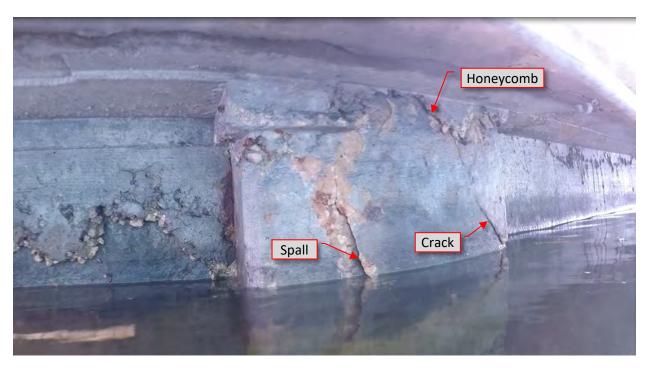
P9. STA 3+00. Spall on west flange, crack on east flange at pile, and honeycomb at top of pile.
